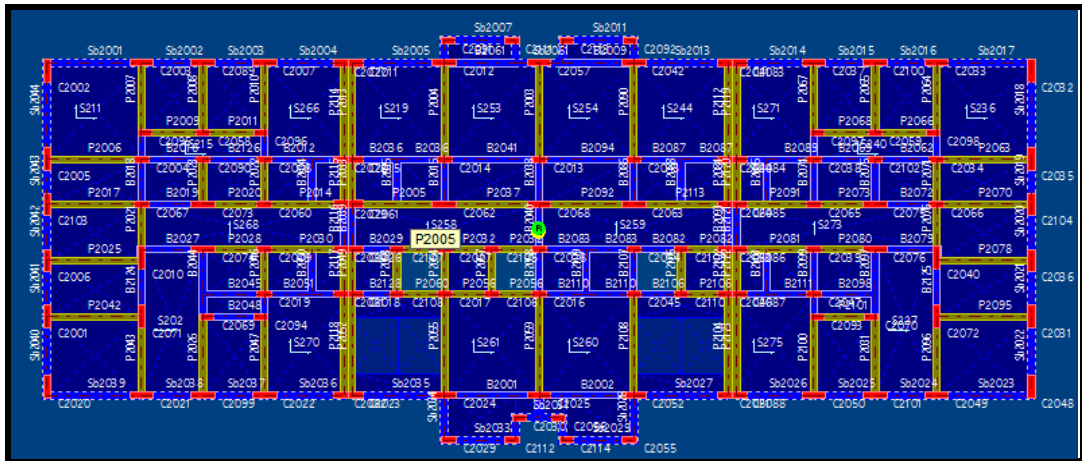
Plan of Buildings with Ten Stories and Tunnel Formwork System
